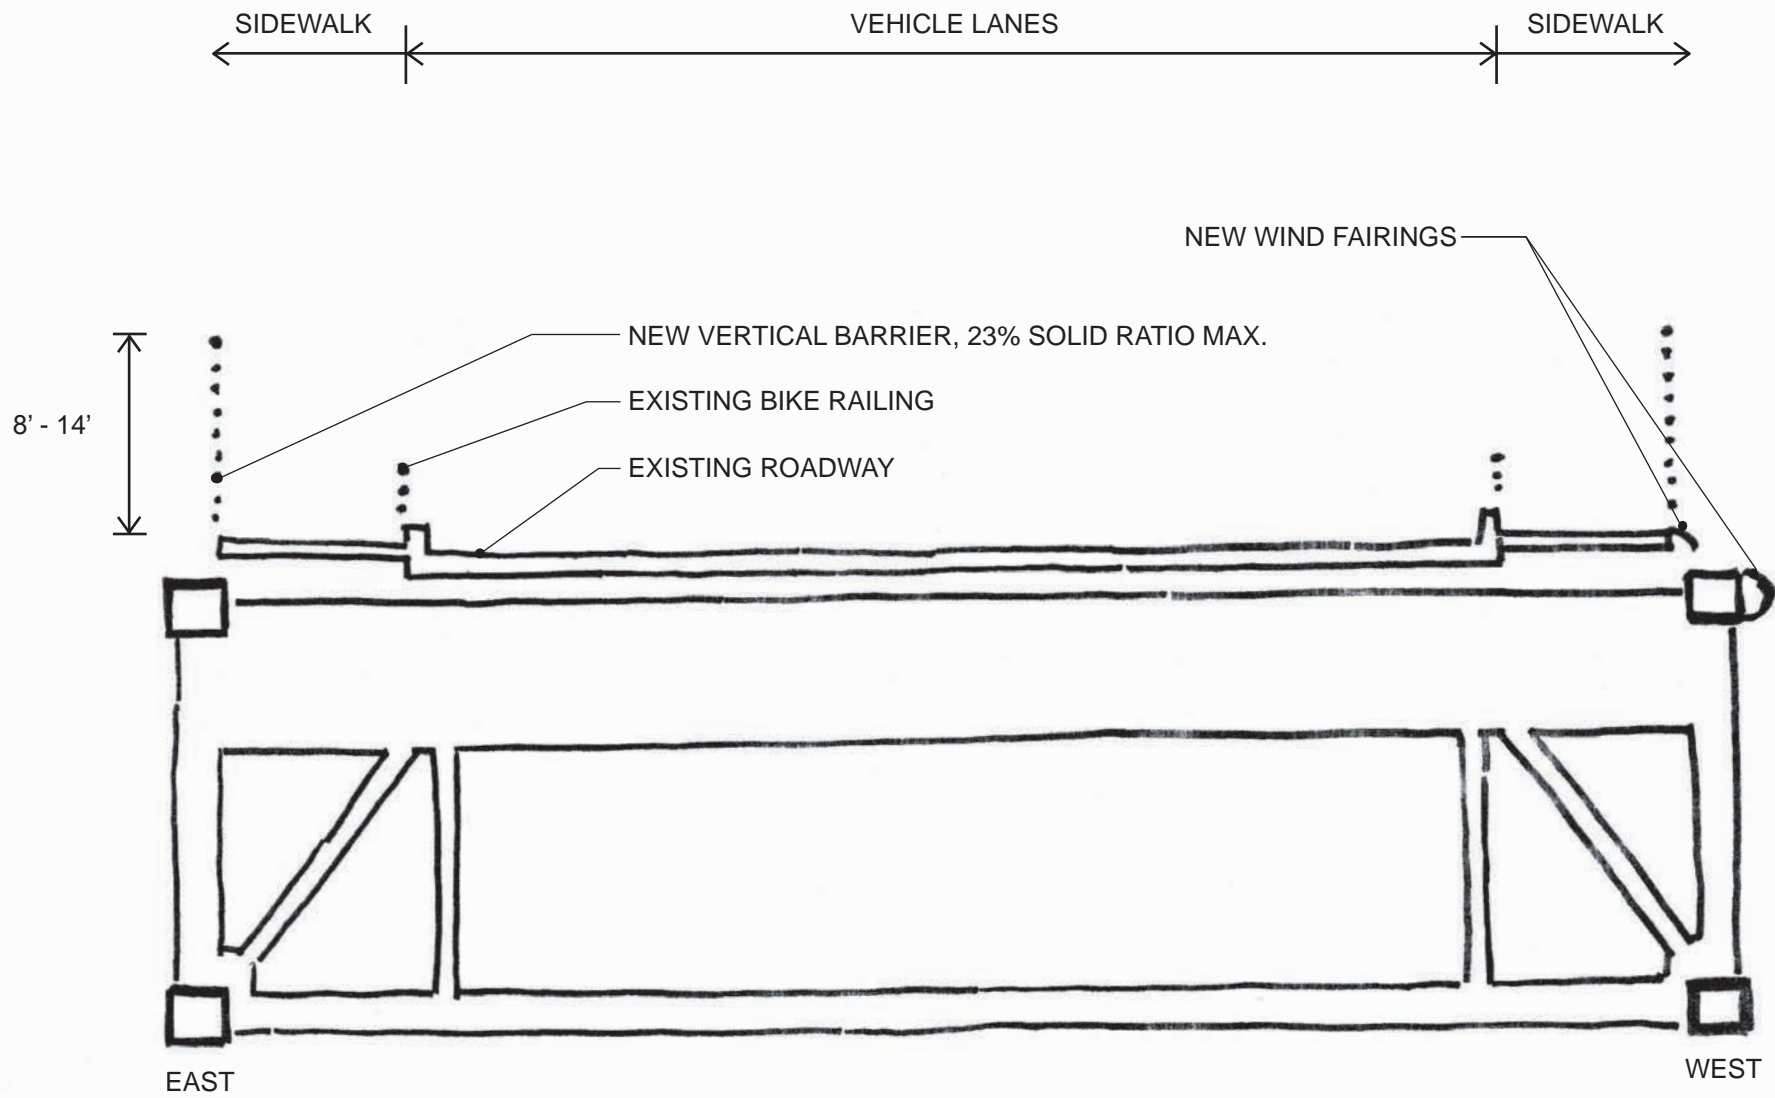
CONCEPT 2 : REPLACING THE EXISTING RAILING; WIND FAIRINGS ON TRUSS
